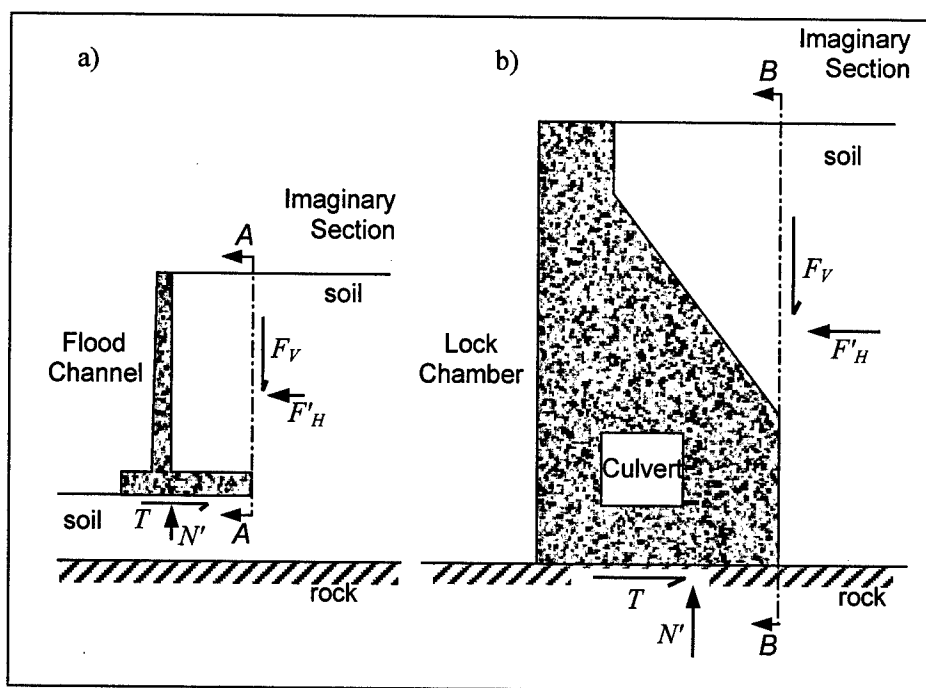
Earth retaining structures typical of Corps projects: (a) soil-founded, cantilever floodwall retaining earthen backfill; (b) rock-founded, massive concrete lock wall retaining earthen backfill
